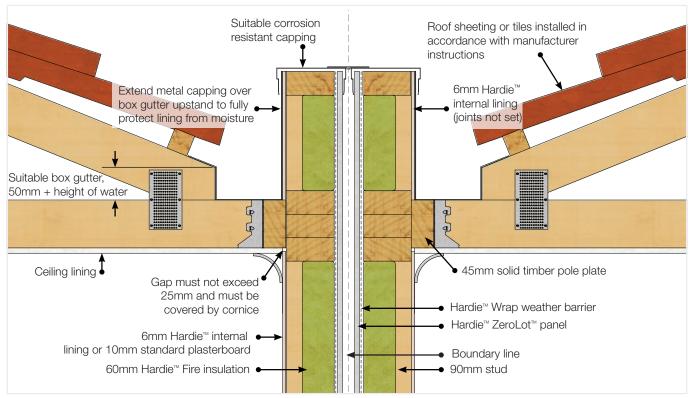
DUAL ZERO LOT PARAPET ROOF WITH PERPENDICULAR TRUSSES
